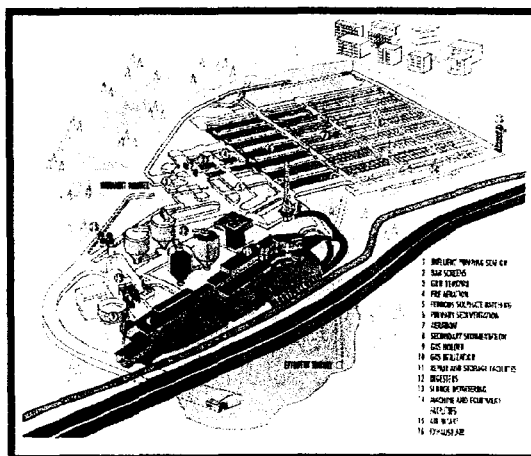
Underground sewage treatment plant in Viikinmaeki wastewater
